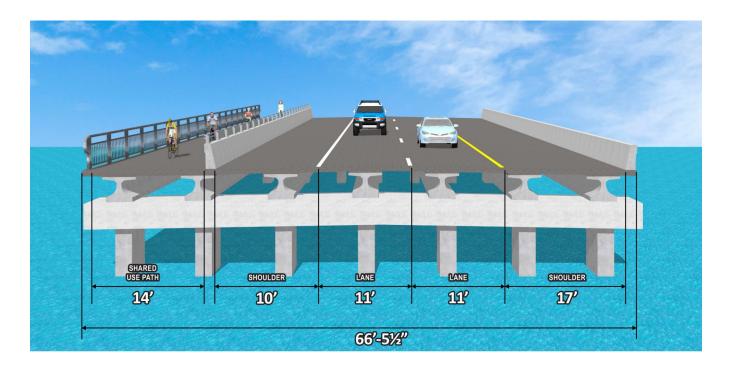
Bridge No. 120025 Recommended Alternative (four-lane configuration)
